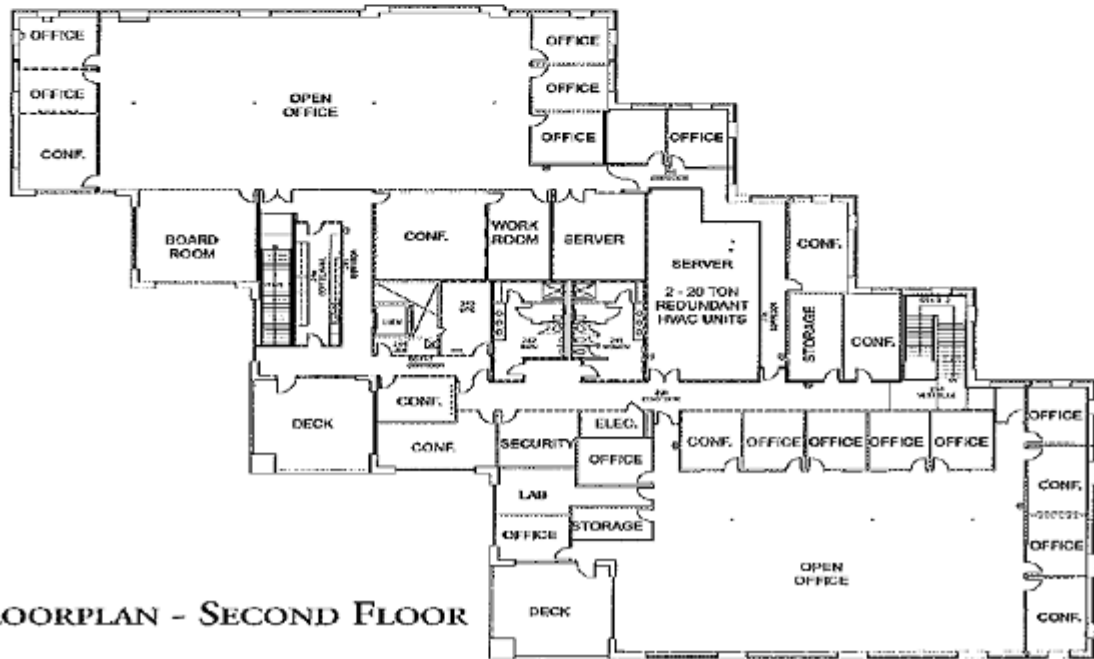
EXHIBIT A — FLOOR PLAN DEPICTING THE PREMISES
